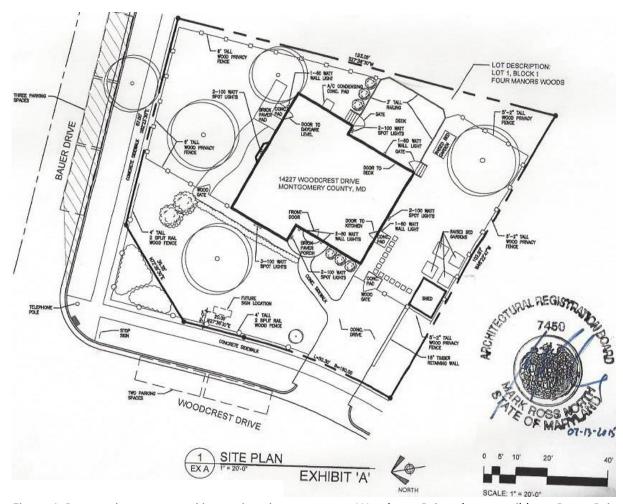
Proposed on-street parking options (two spaces on Woodcrest Drive, three possible on Bauer Drive)
